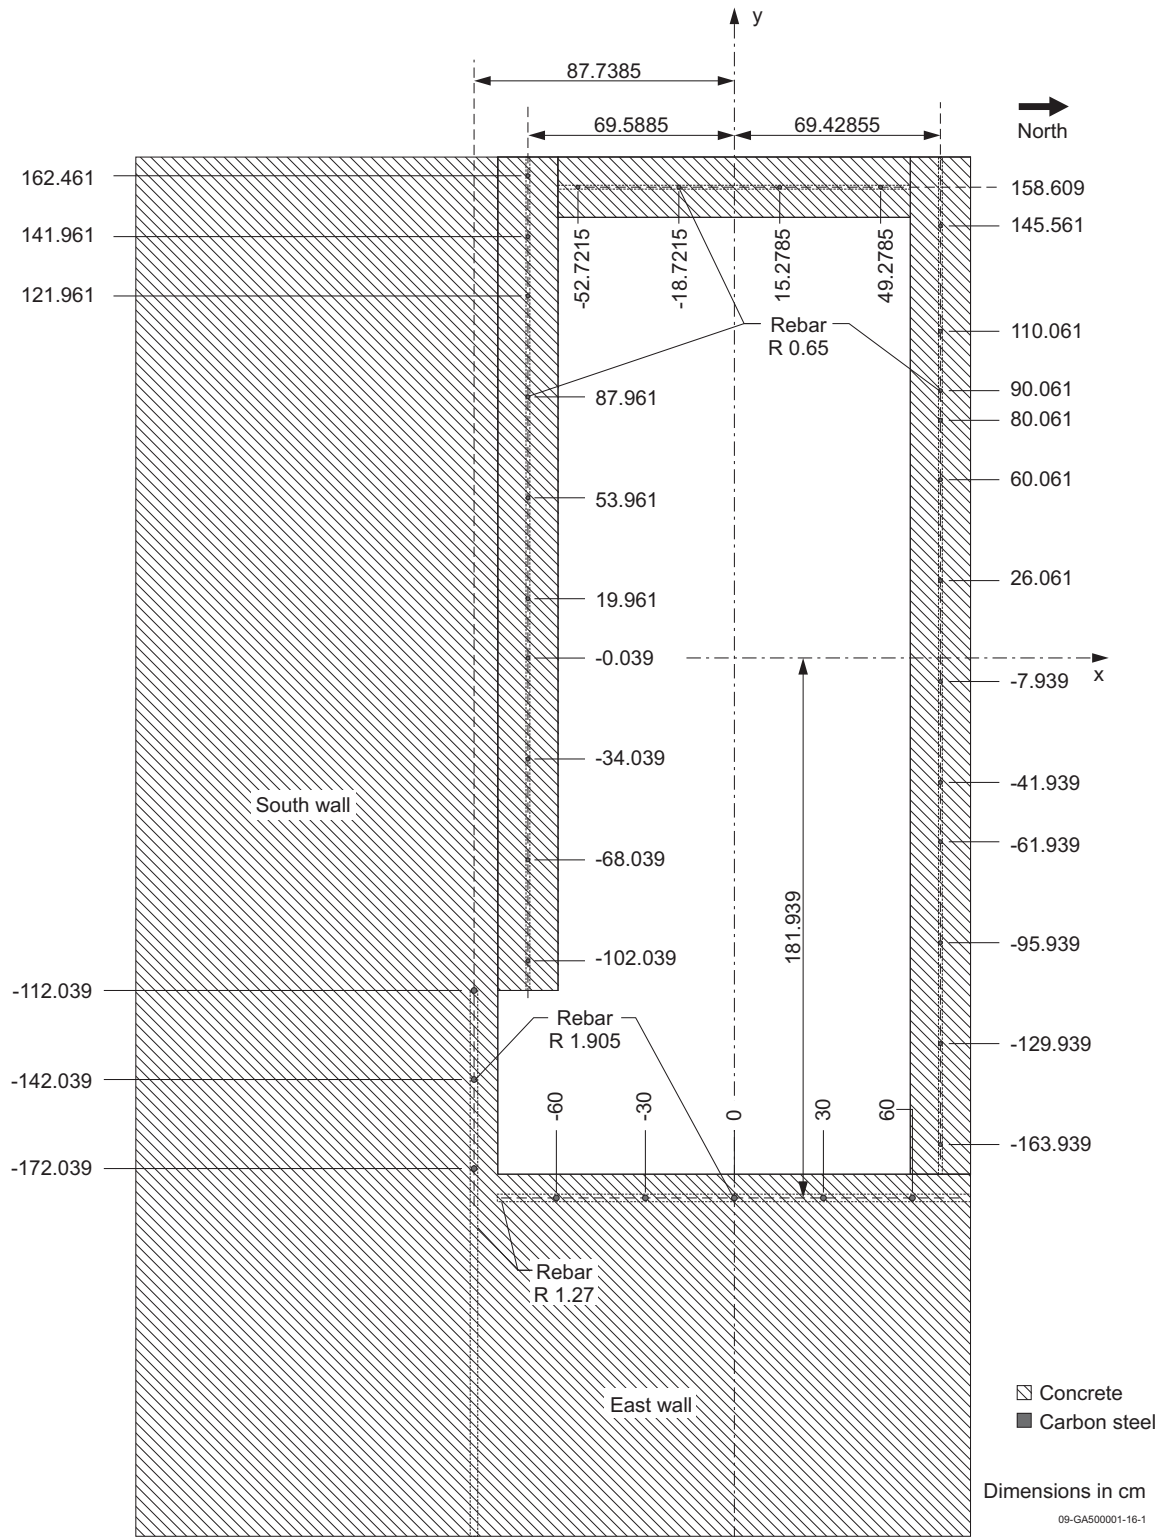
Detailed Model, Top View of Enclosure Showing Rebar Positions in Walls and Panels.
